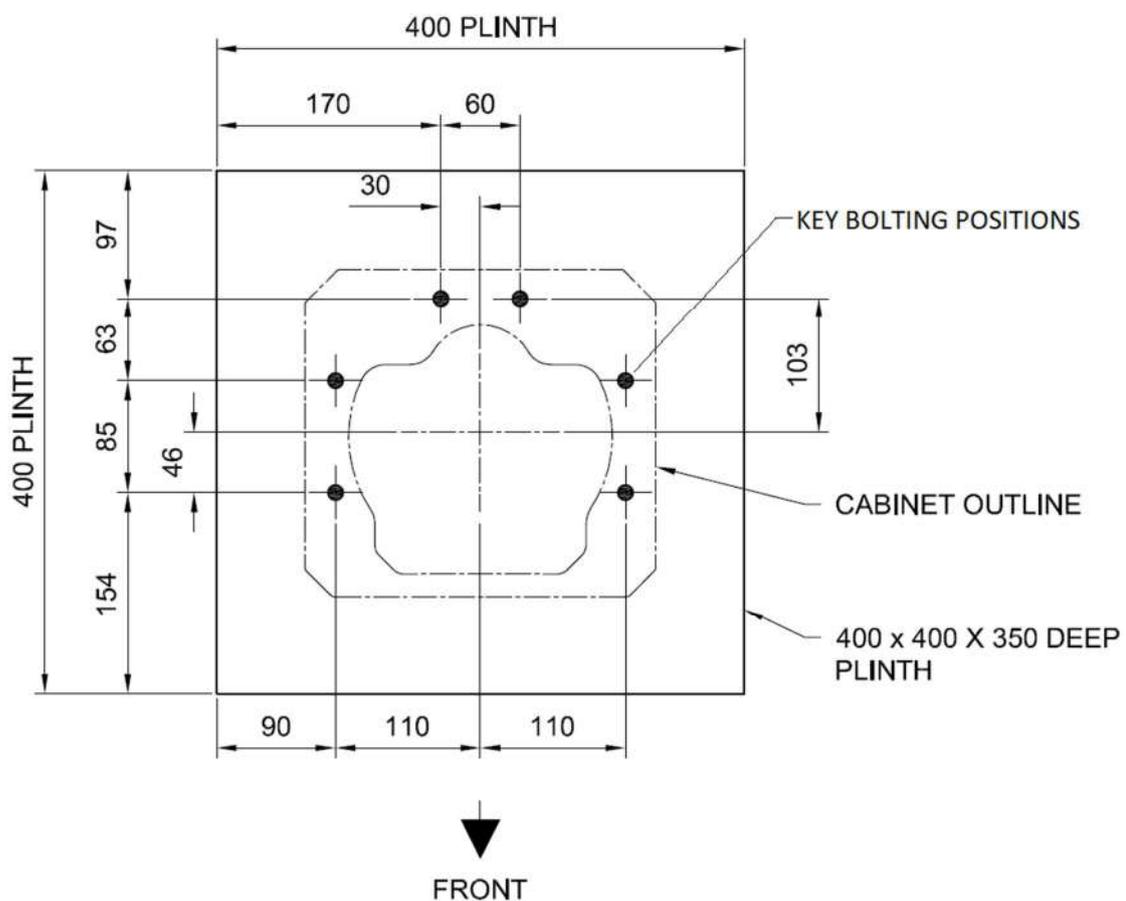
Plan View – Plinth with Conduit Position, Cabinet Outline & Bolting Positions
